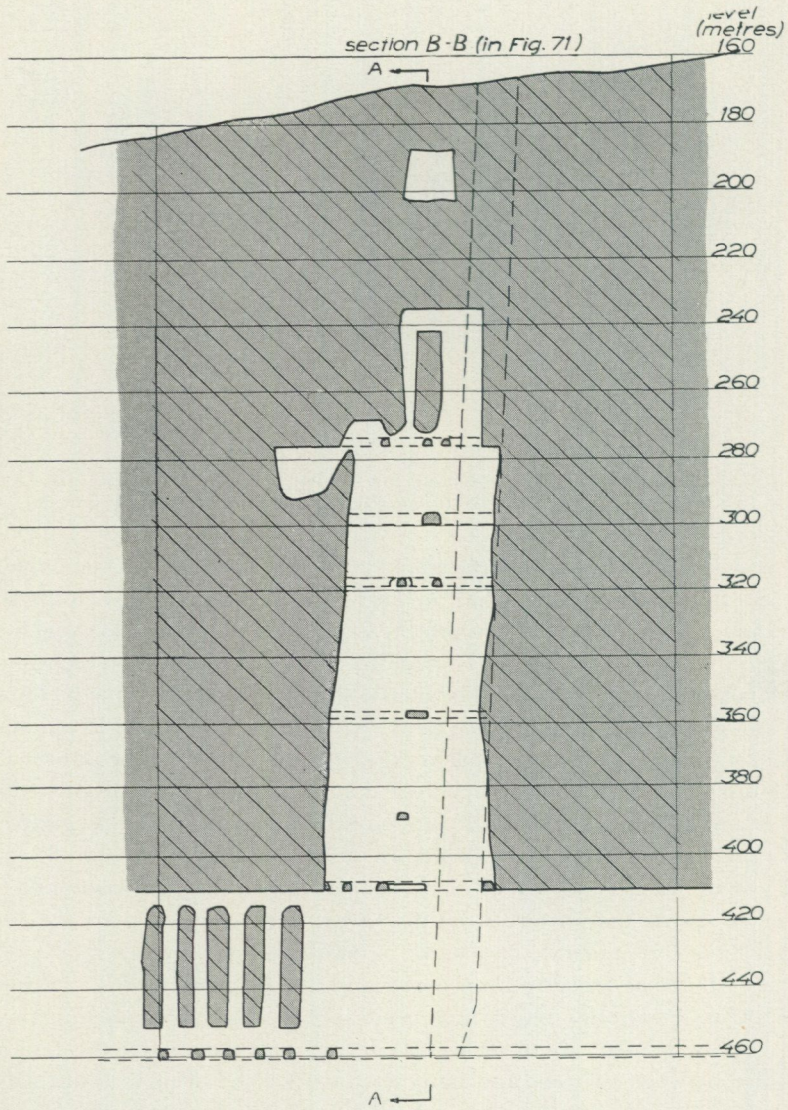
Cross-section B—B of the pillar remaining in Kaptenslagret. Fig. 71 shows the location of section B—B. For the longitudinal section A—A see Fig. 65.
